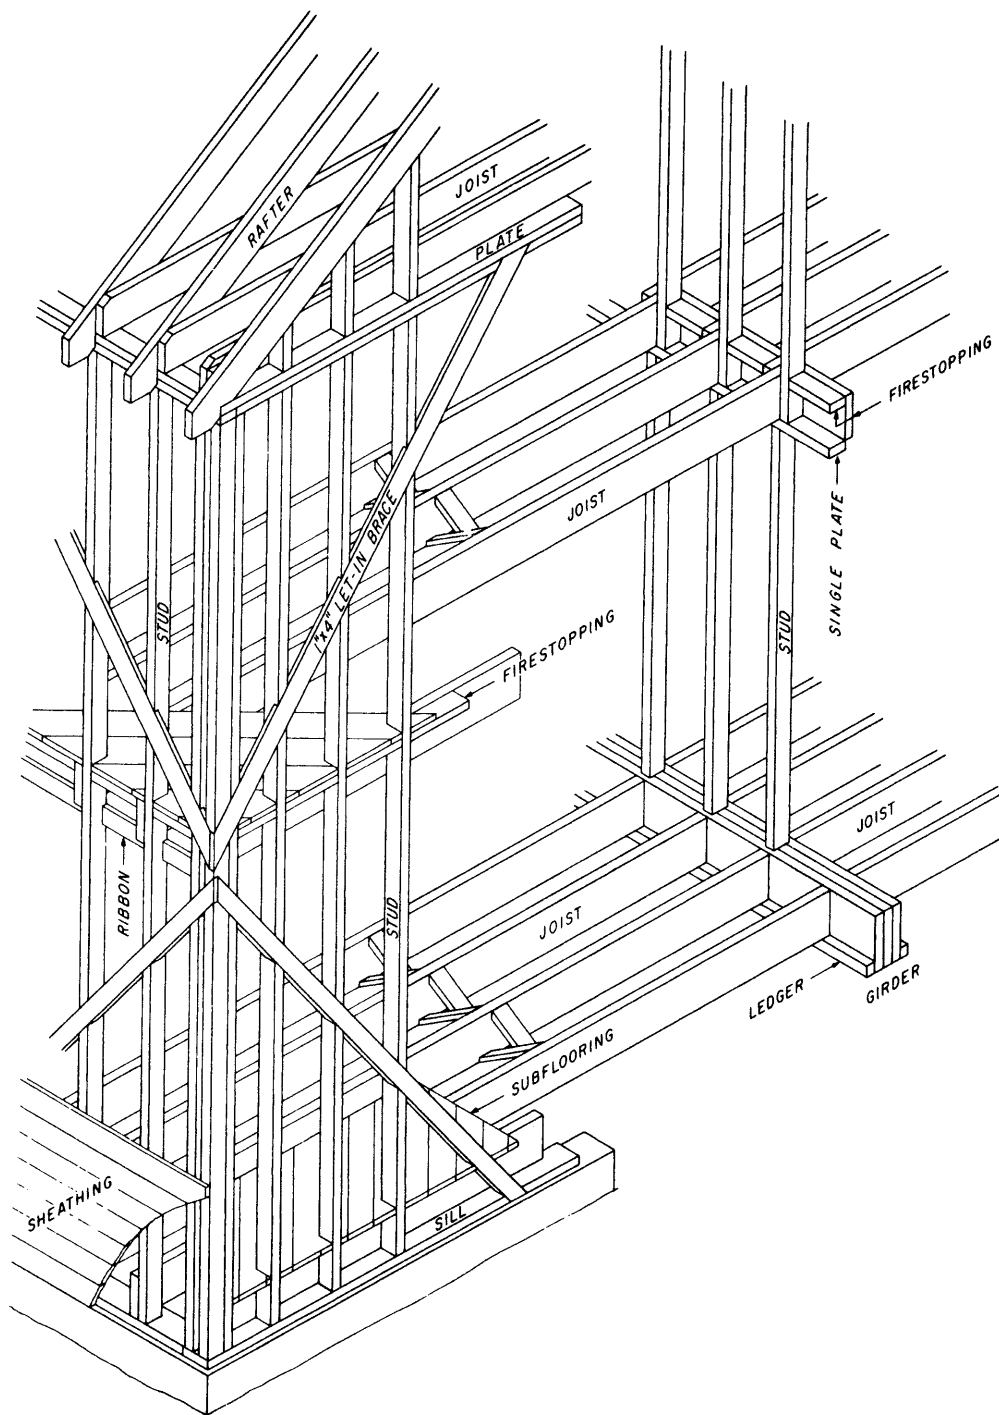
Balloon frame construction. (Courtesy of American Forest and Paper Association)
